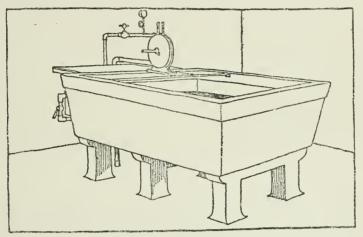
A CONCRETE BOTTLE-WASHING TROUGH FOR DAIRY.
